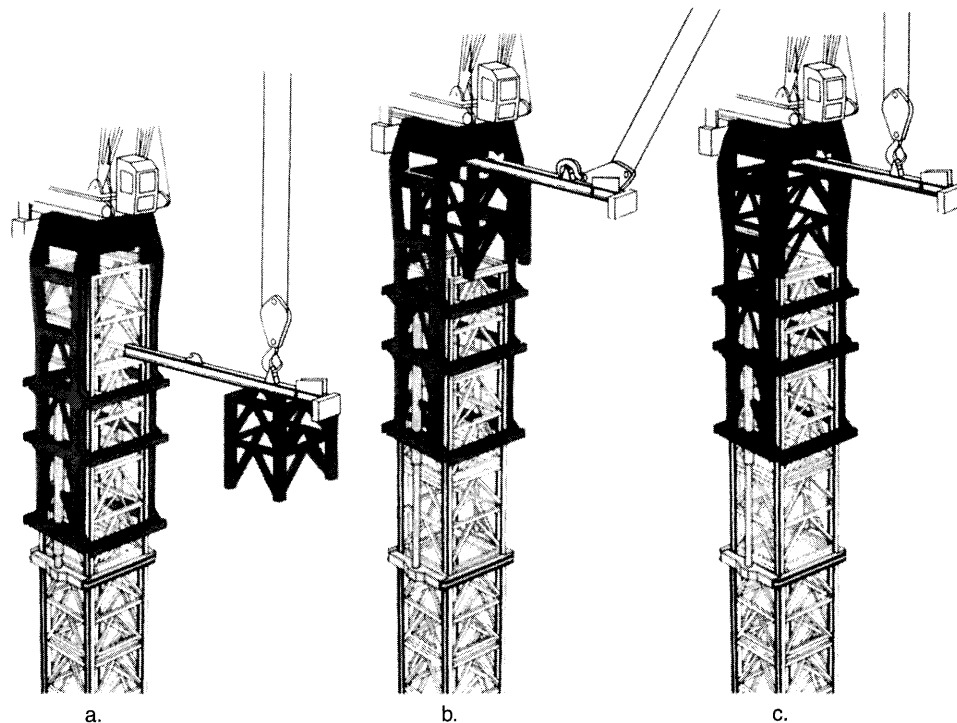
Self-raising tower crane mast. (Courtesy of FMC Construction Equipment Group)
